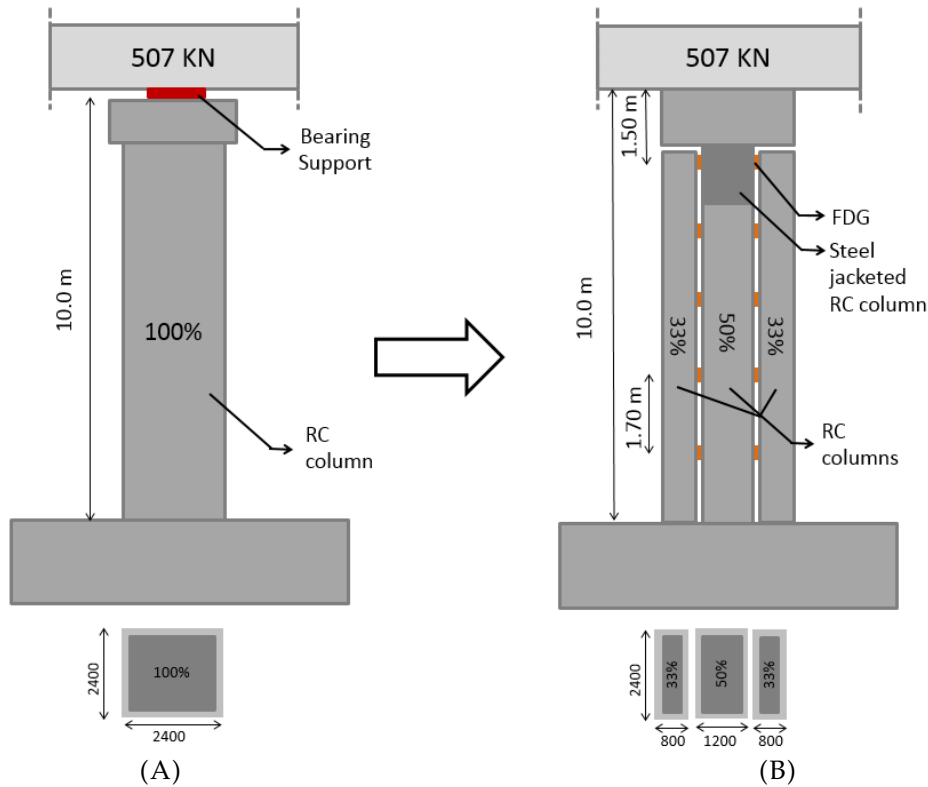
(A) The conventional bridge pier (with 100% cross-section area of the reference [8]) and (B) the proposed bridge pier connected by FDG (with 116% cross-section area of the conventional bridge pier).
